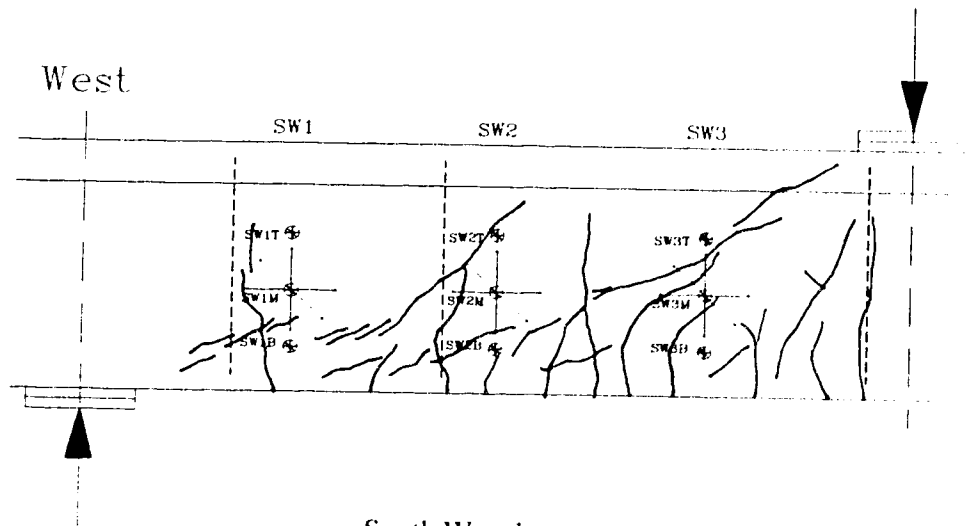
Girder 1, East span - Crack patterns
